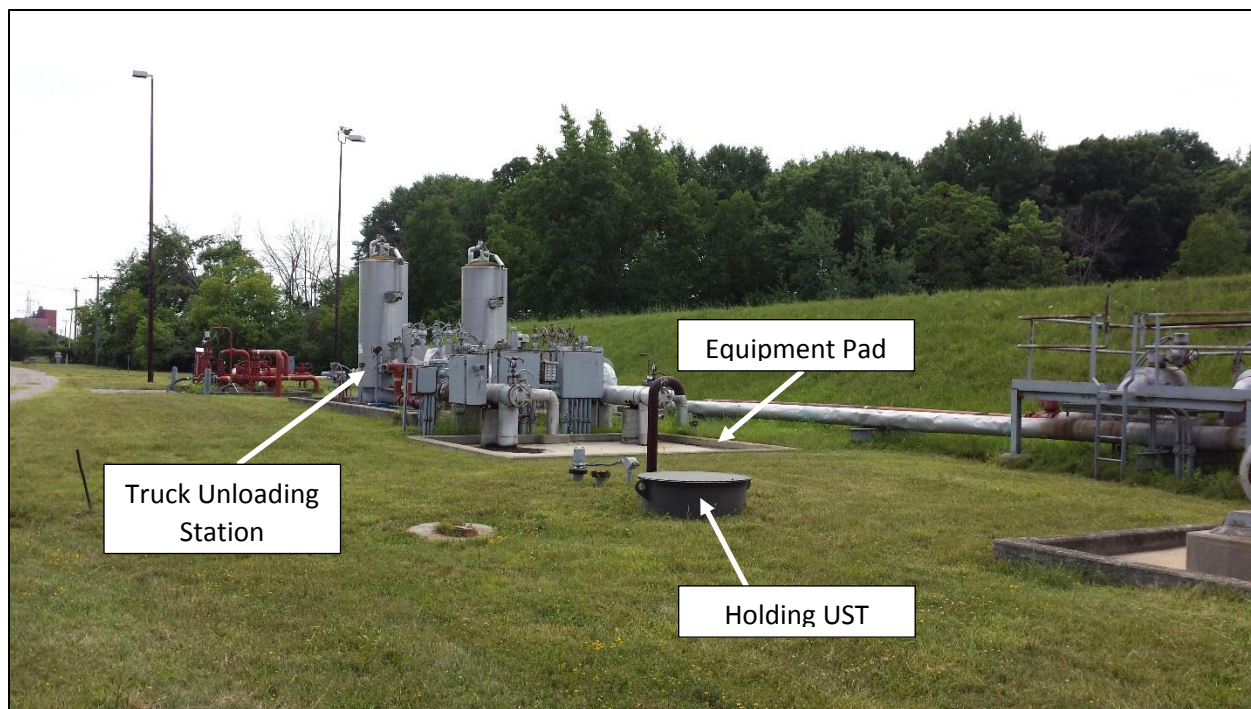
Section of above ground piping, including the truck unloading station, equipment pad, and southern holding UST. Looking south.
